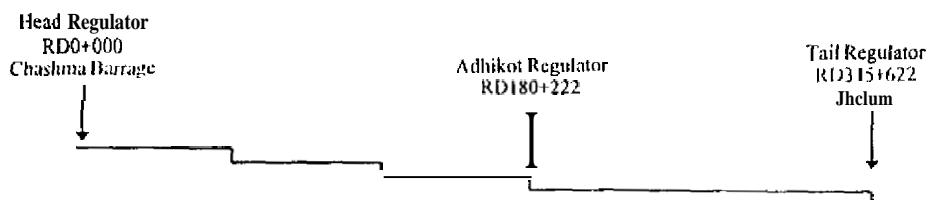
schematic plan of Chashma Jhelum Link Canal
